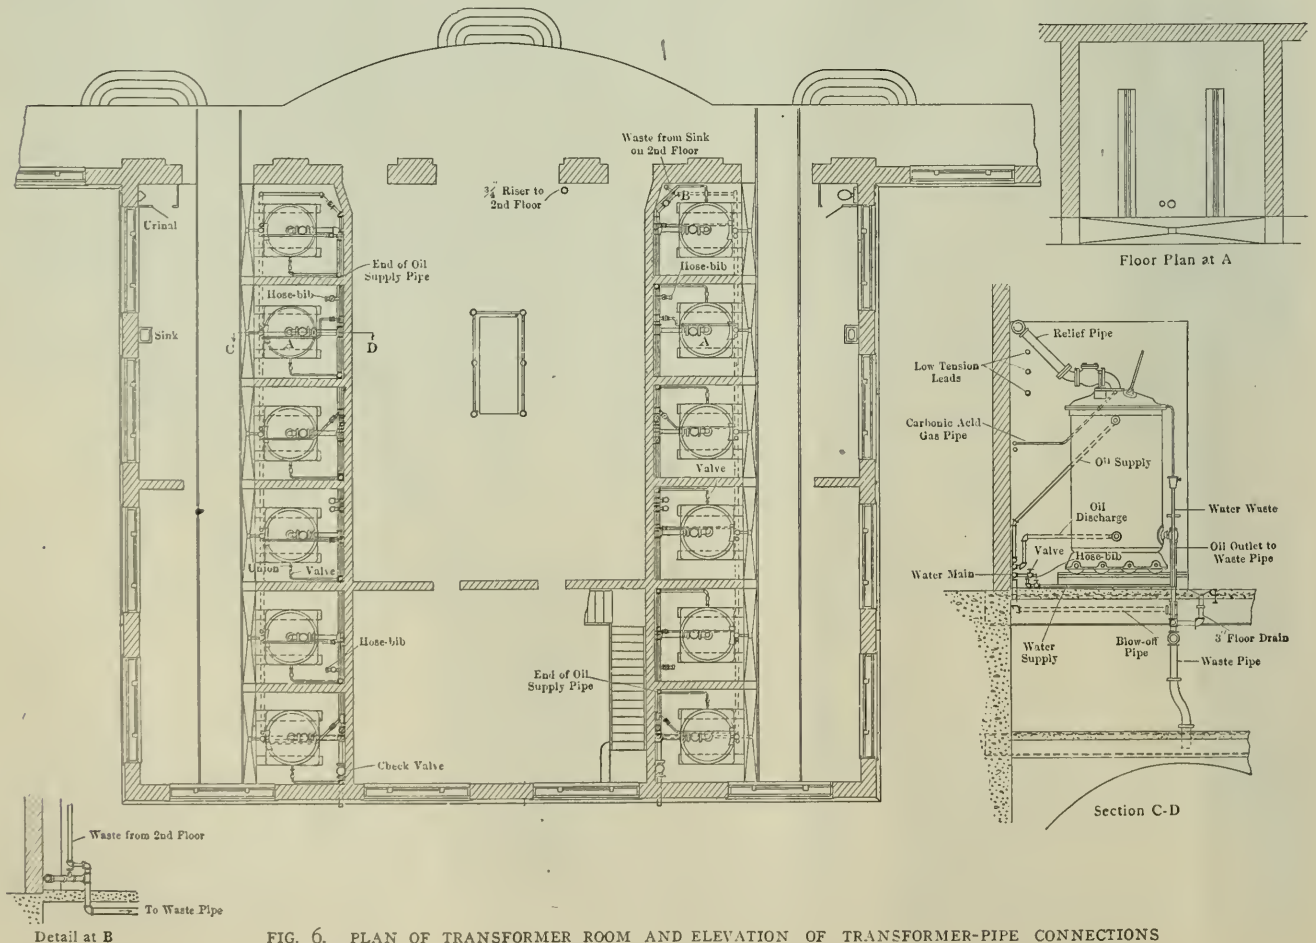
PLAN OF TRANSFORMER ROOM AND ELEVATION OF TRANSFORMER-PIPE CONNECTIONS
